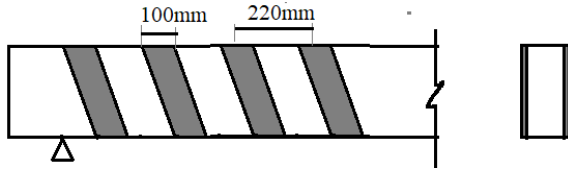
CFRP Strengthening of beam with 450 oriented side stirrups
